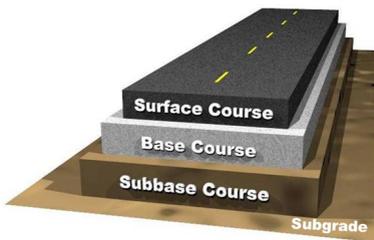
Cross-section of flexible pavement system (Muench 2006)
